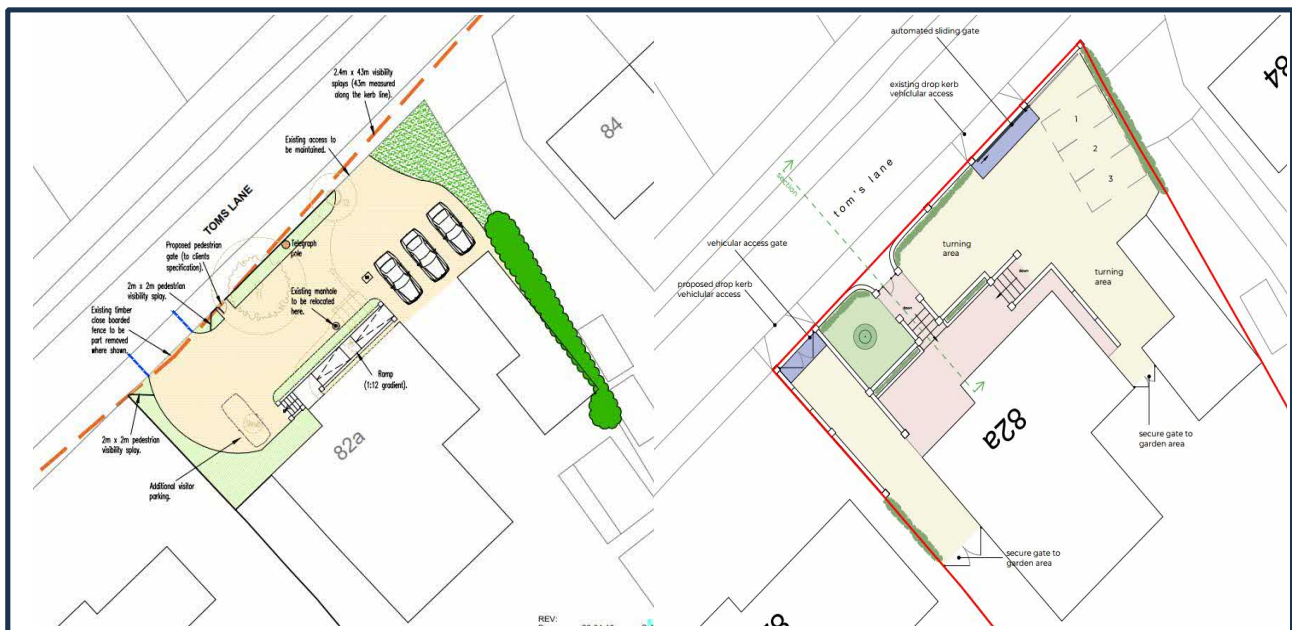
Side by side comparison of the site plan approved under 18/0536/FUL and the current, proposed site plan.
